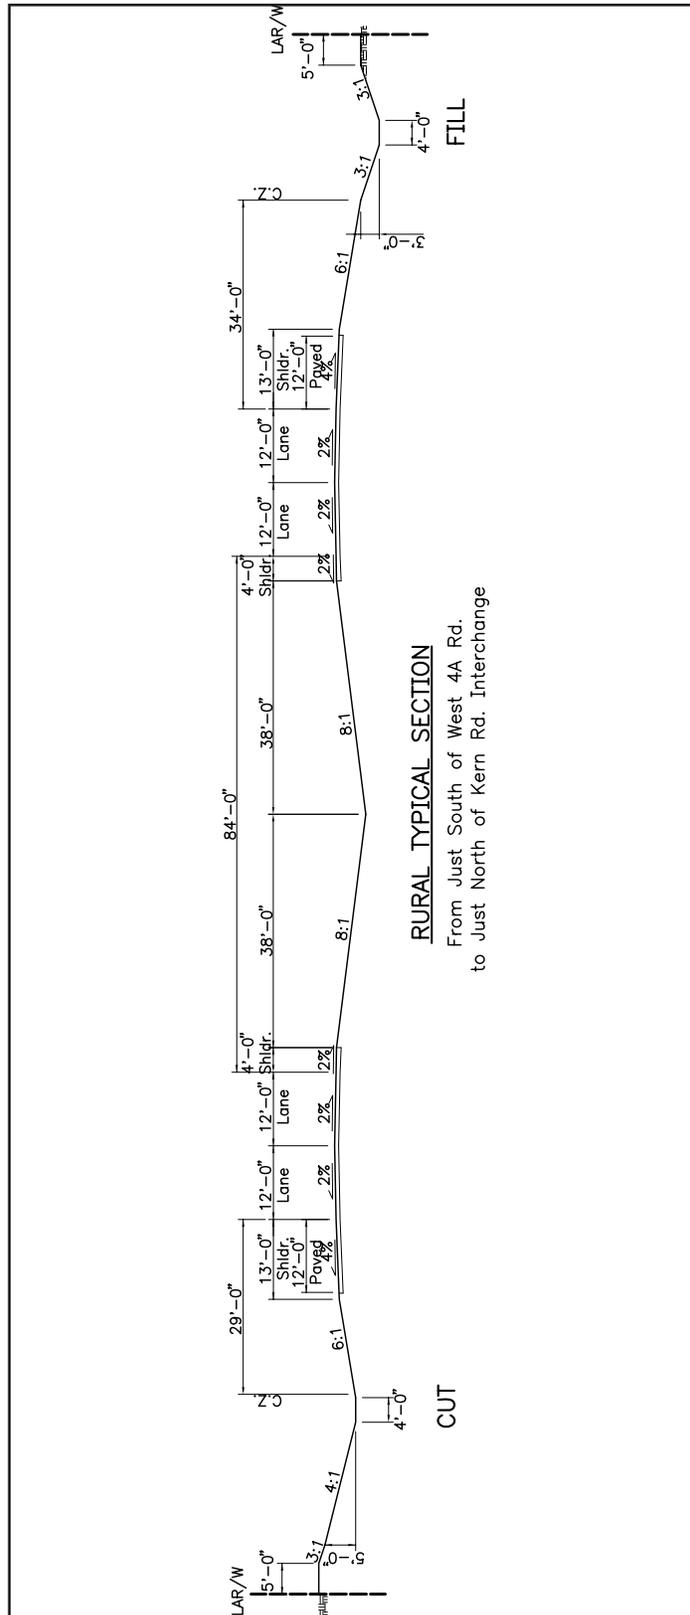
Rural Typical Section (From Just South of West 4A Road to Just North of the Kern Road Interchange)
